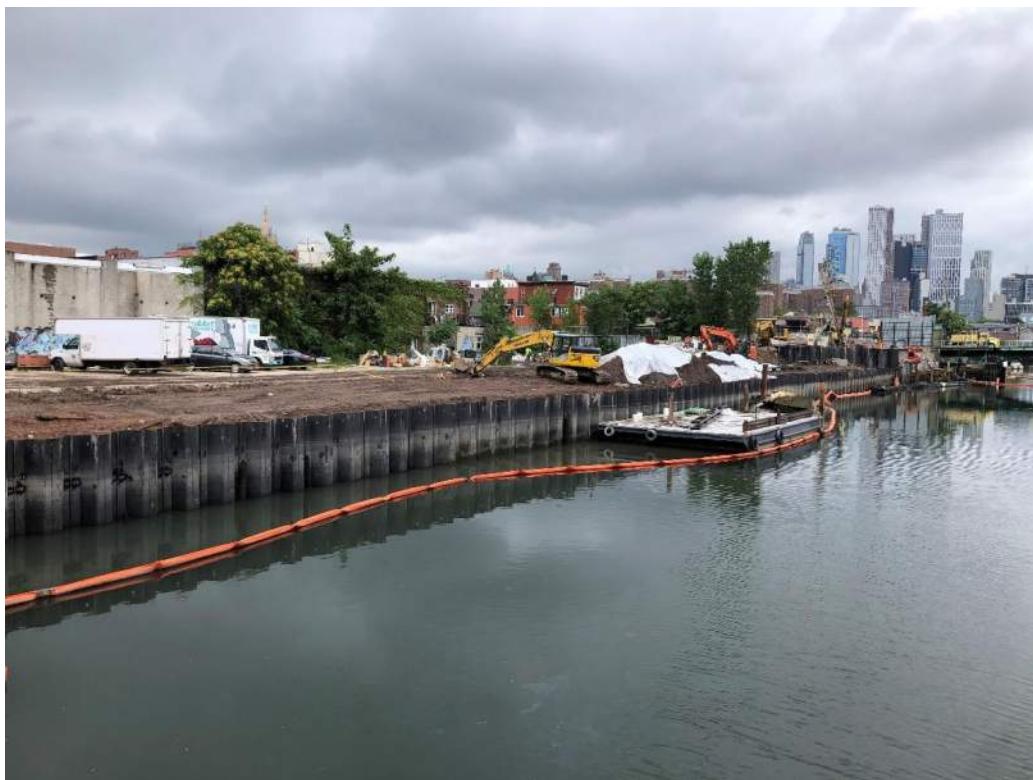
View of the site at the end of the day from the Carroll Street Bridge (facing northwest).
